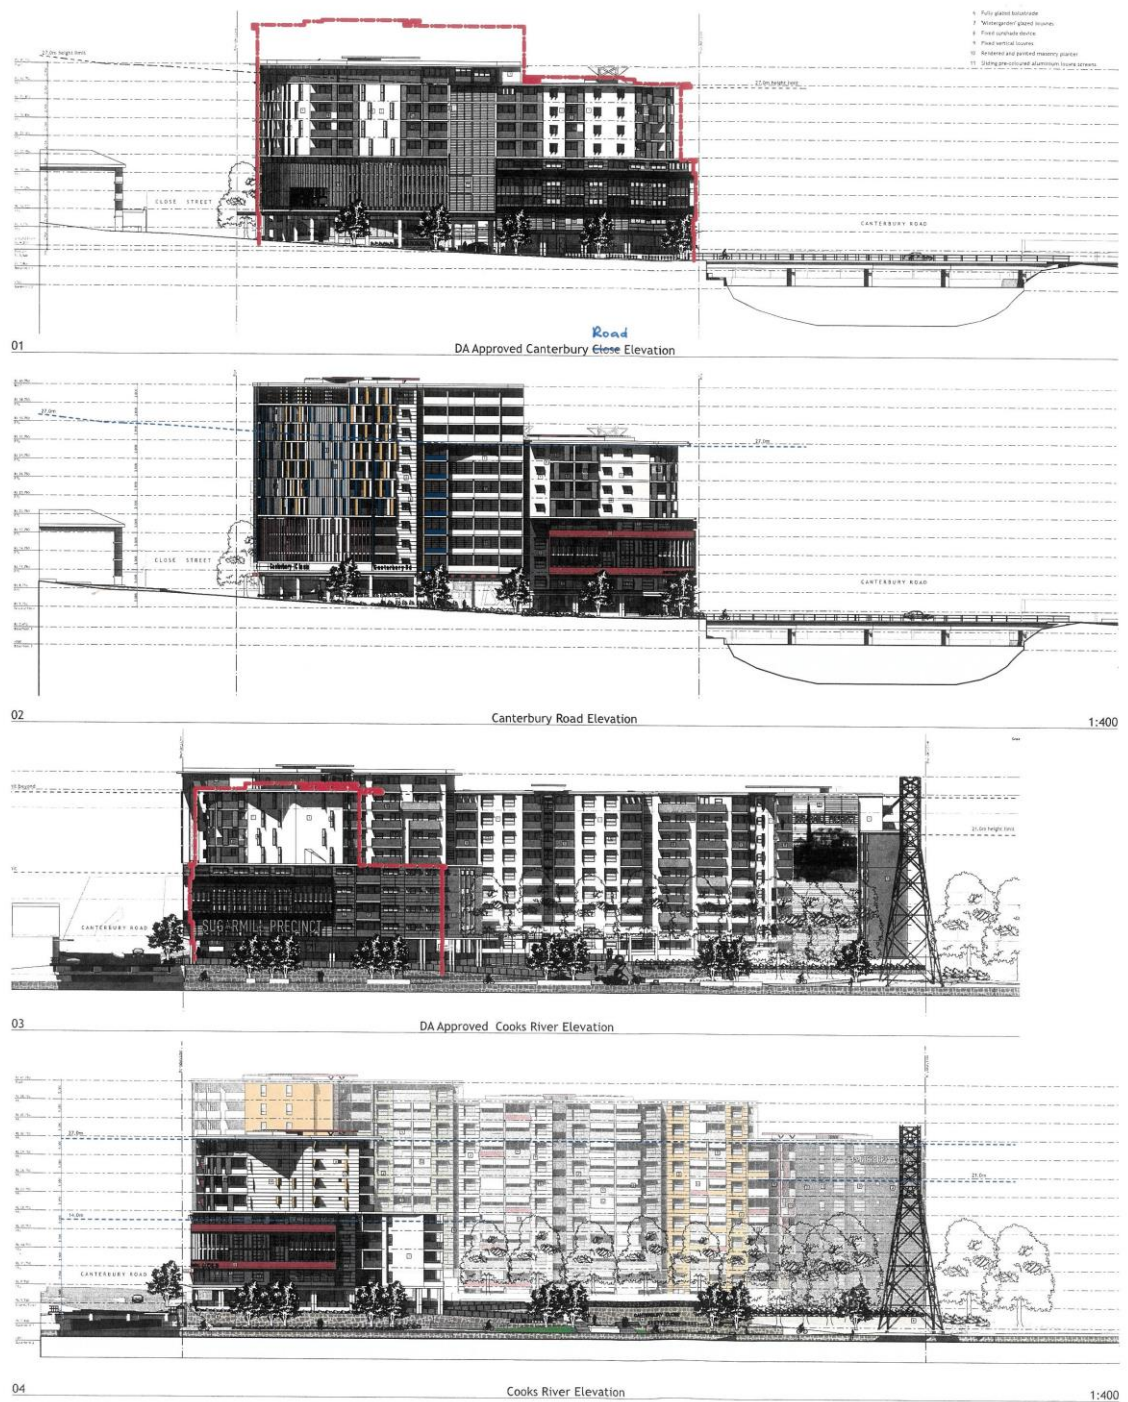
Canterbury Road Elevation, Cooks River Elevation Drawing 11.119.S4.55.200 (DA Check).A (Ex C-A, Tab 3).
